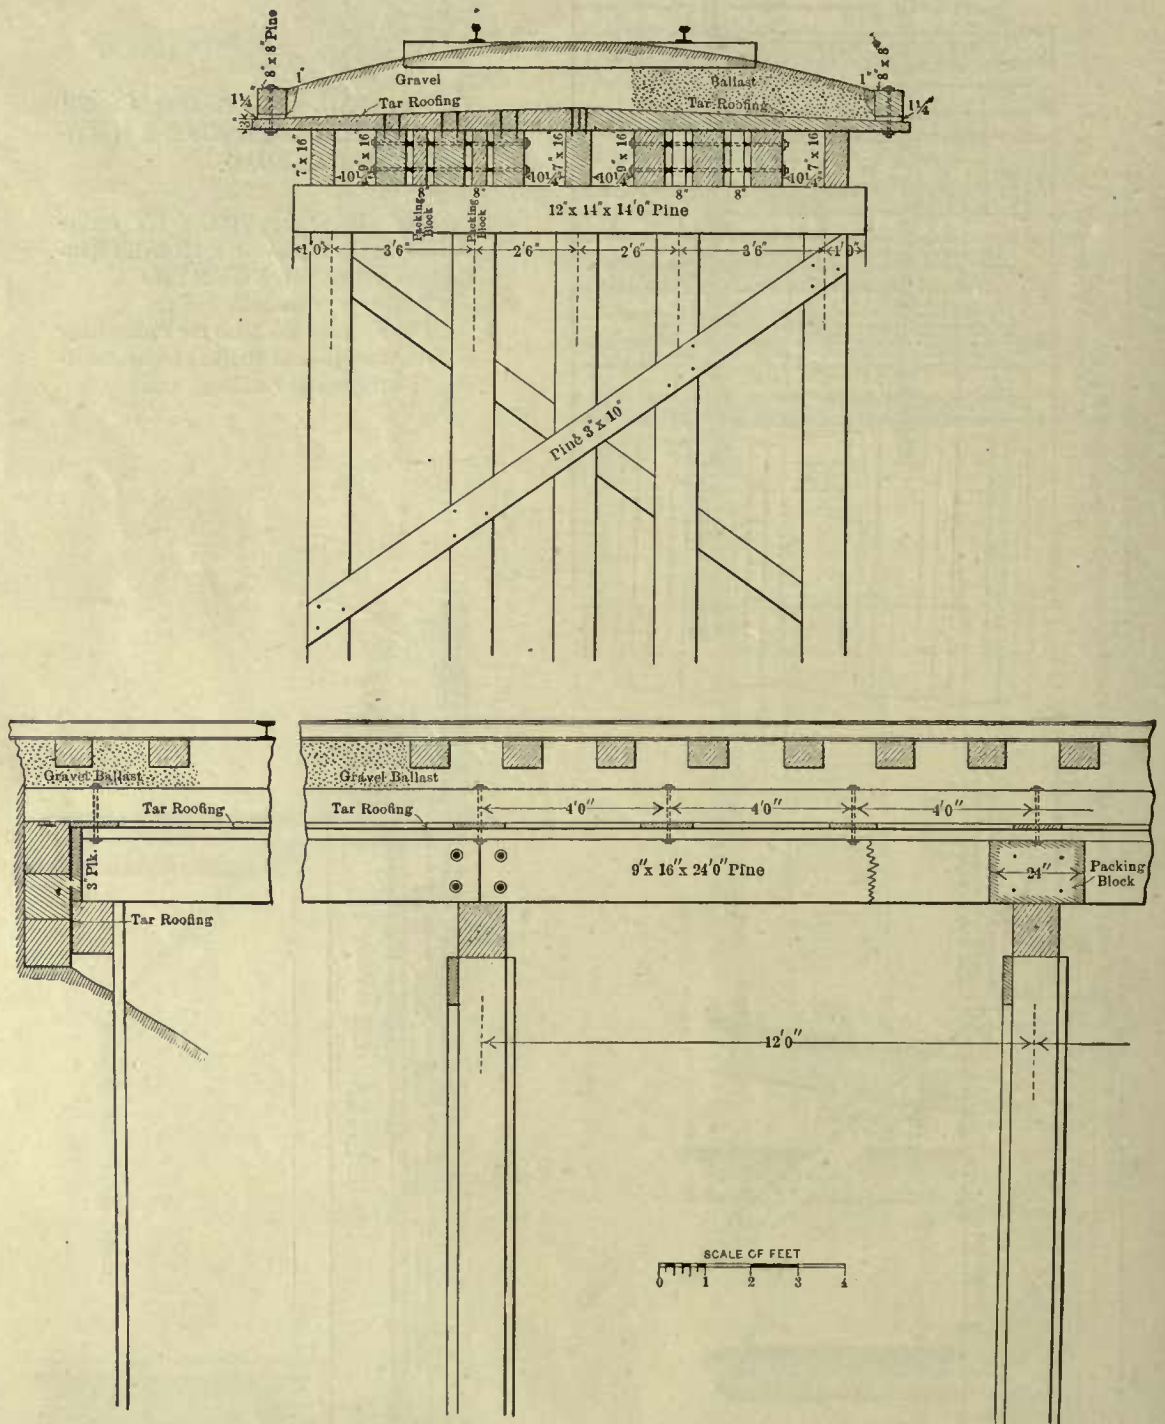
PLATE LXIV.—BALLASTED FLOOR TRESTLE, GRAND RAPIDS & INDIANA RAILWAY.
